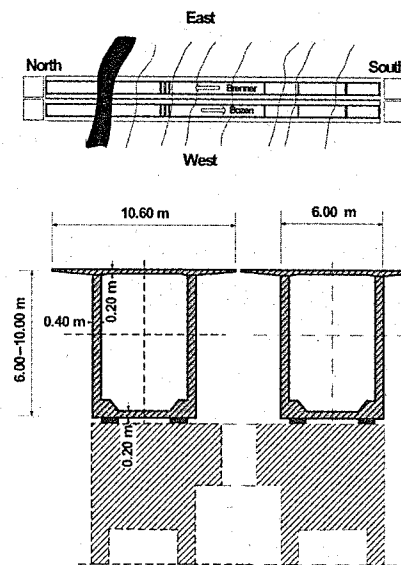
Ground plan and cross section of the cast – in place balanced cantilever beam – “Colle Isarco Bridge”.
